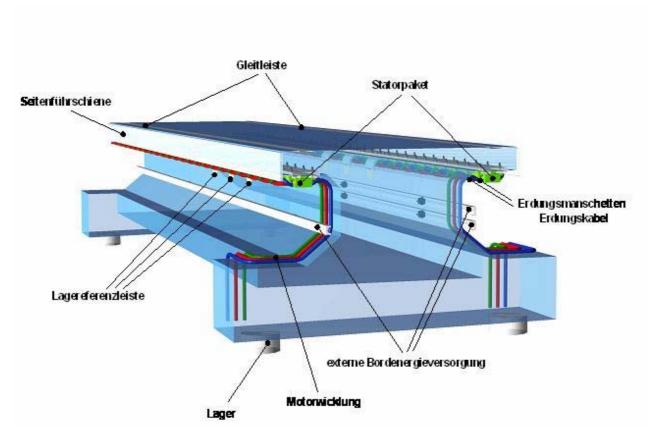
Arrangement of the maglev train specific guideway equipment on the guideway beam
